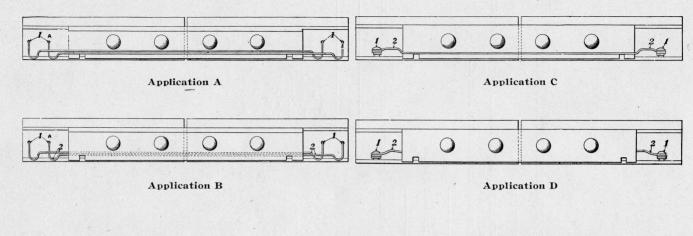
#### DETAILS OF KEYSTONE INSULATED RAIL JOINT
